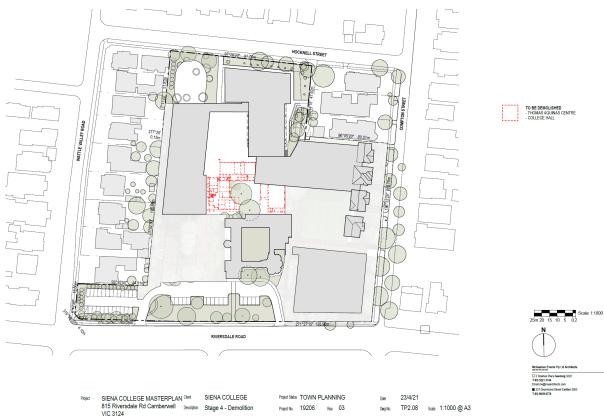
Proposed Stage 4 demolition works. (McGlashan Everist, 23 April 2021).
